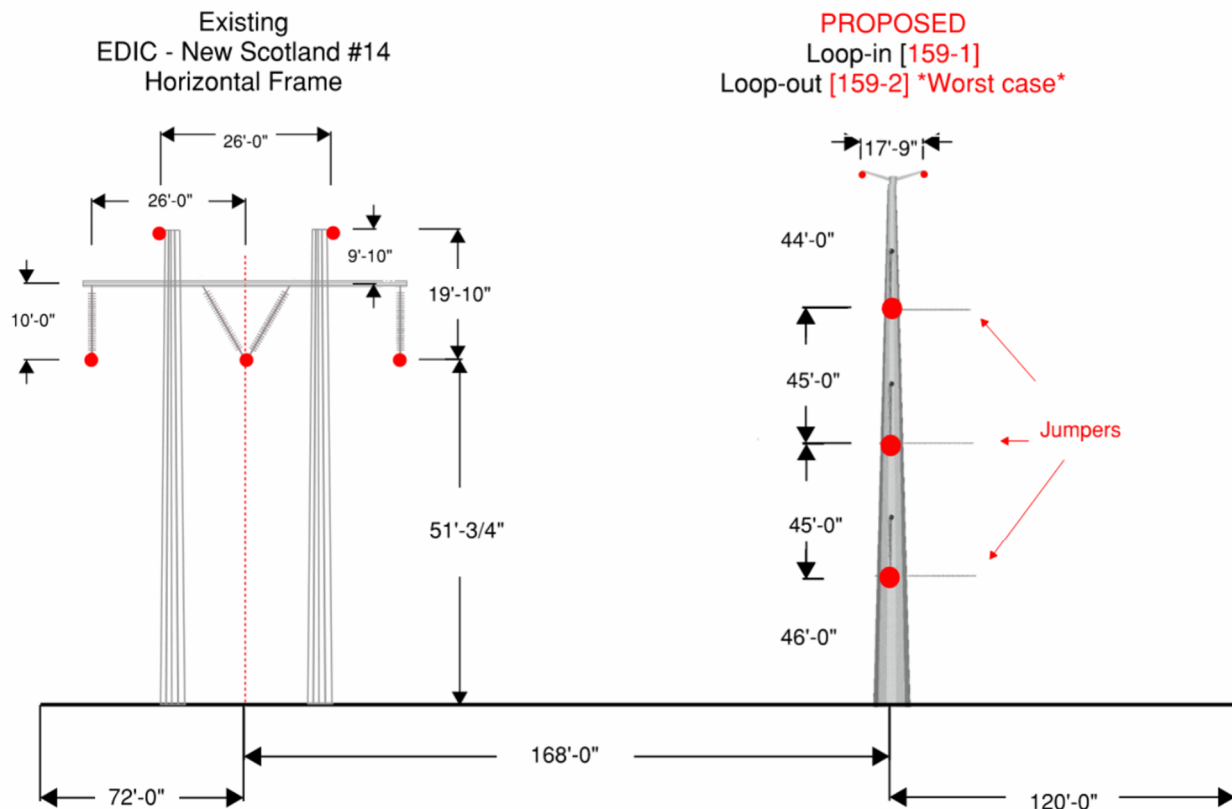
Existing Line #14 and Proposed #18 Loop-in/Loop-out (Worst Case) Cross Section
